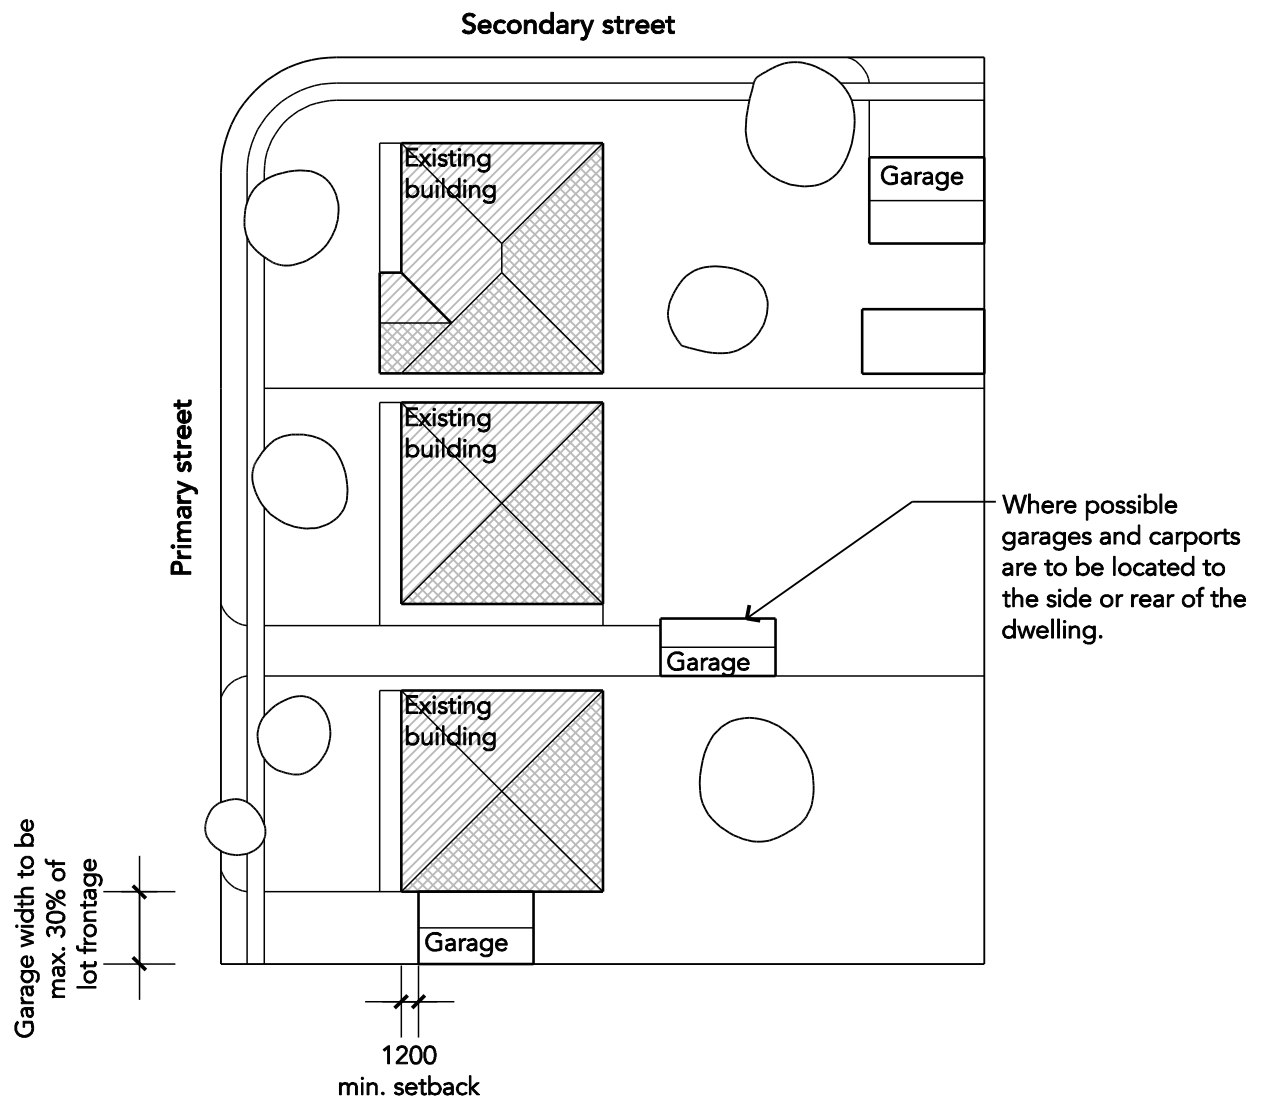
Site plan illustrating compatible garages in residential developments – *Griffiths Architects 2012.
